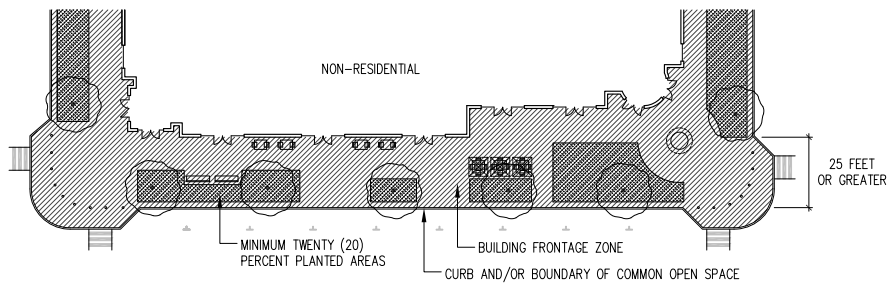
PLANTED AREAS WITHIN BUILDING FRONTAGE ZONE (25 FEET OR GREATER IN DEPTH)- NON-RESIDENTIAL
